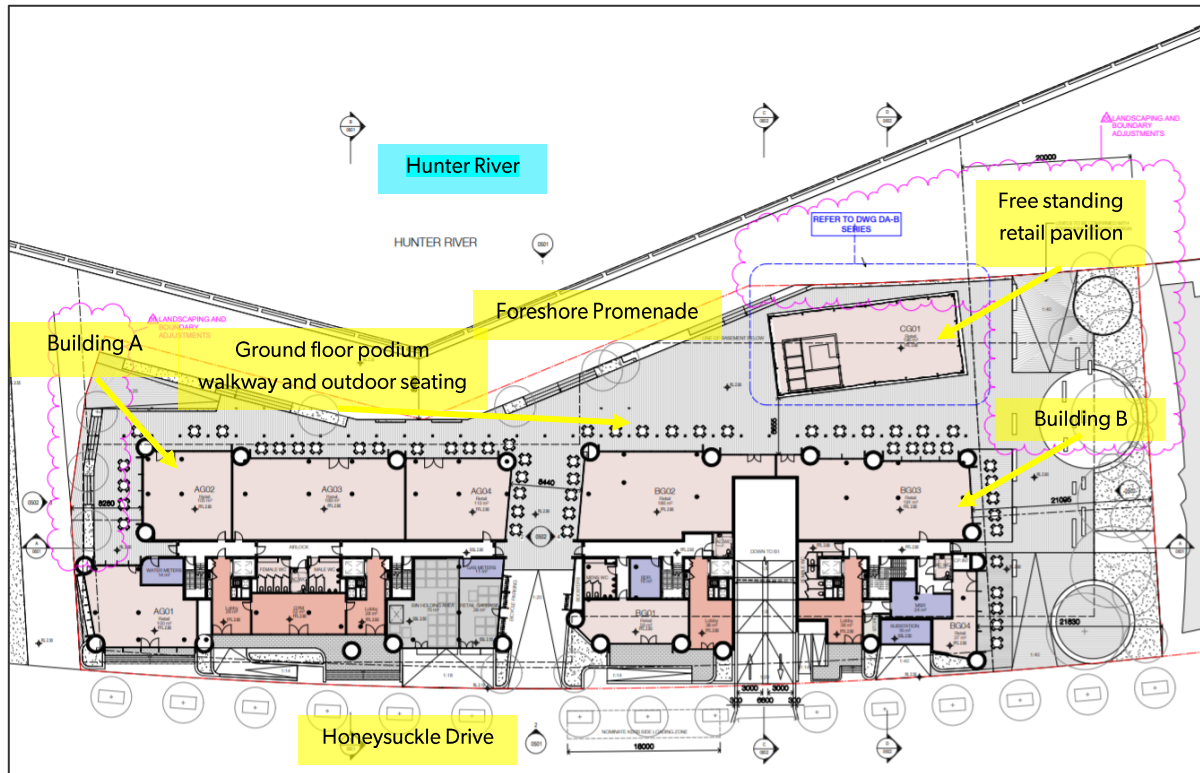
| Ground floor and site plan (Source: Applicant's RtS).
